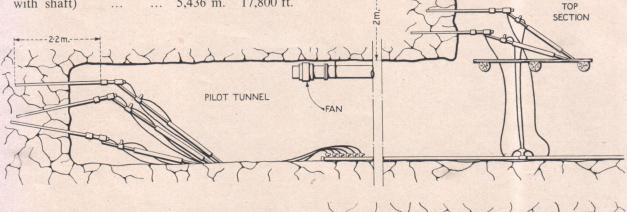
(top left). Subdivision of the tunnel section for excavation
